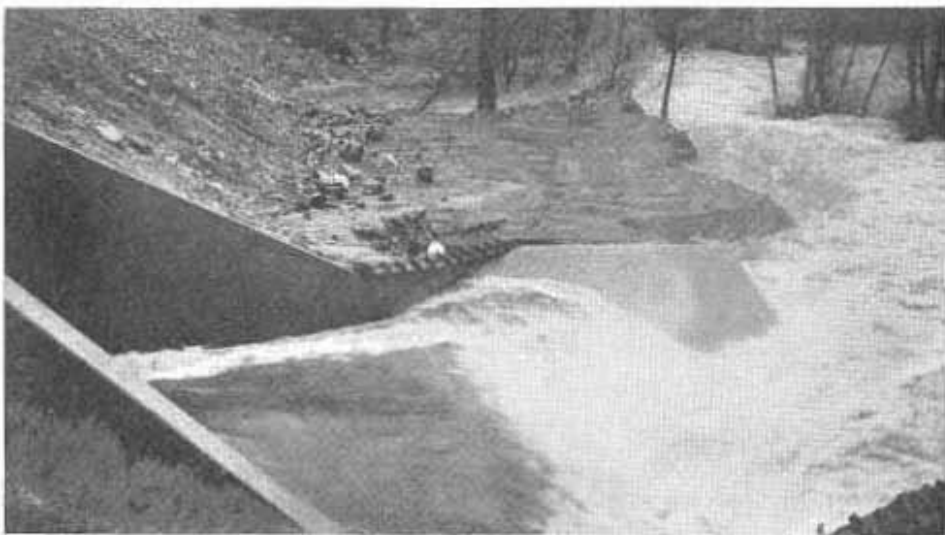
Close up of Salt Creek outlet, shooting at 22 feet per second
